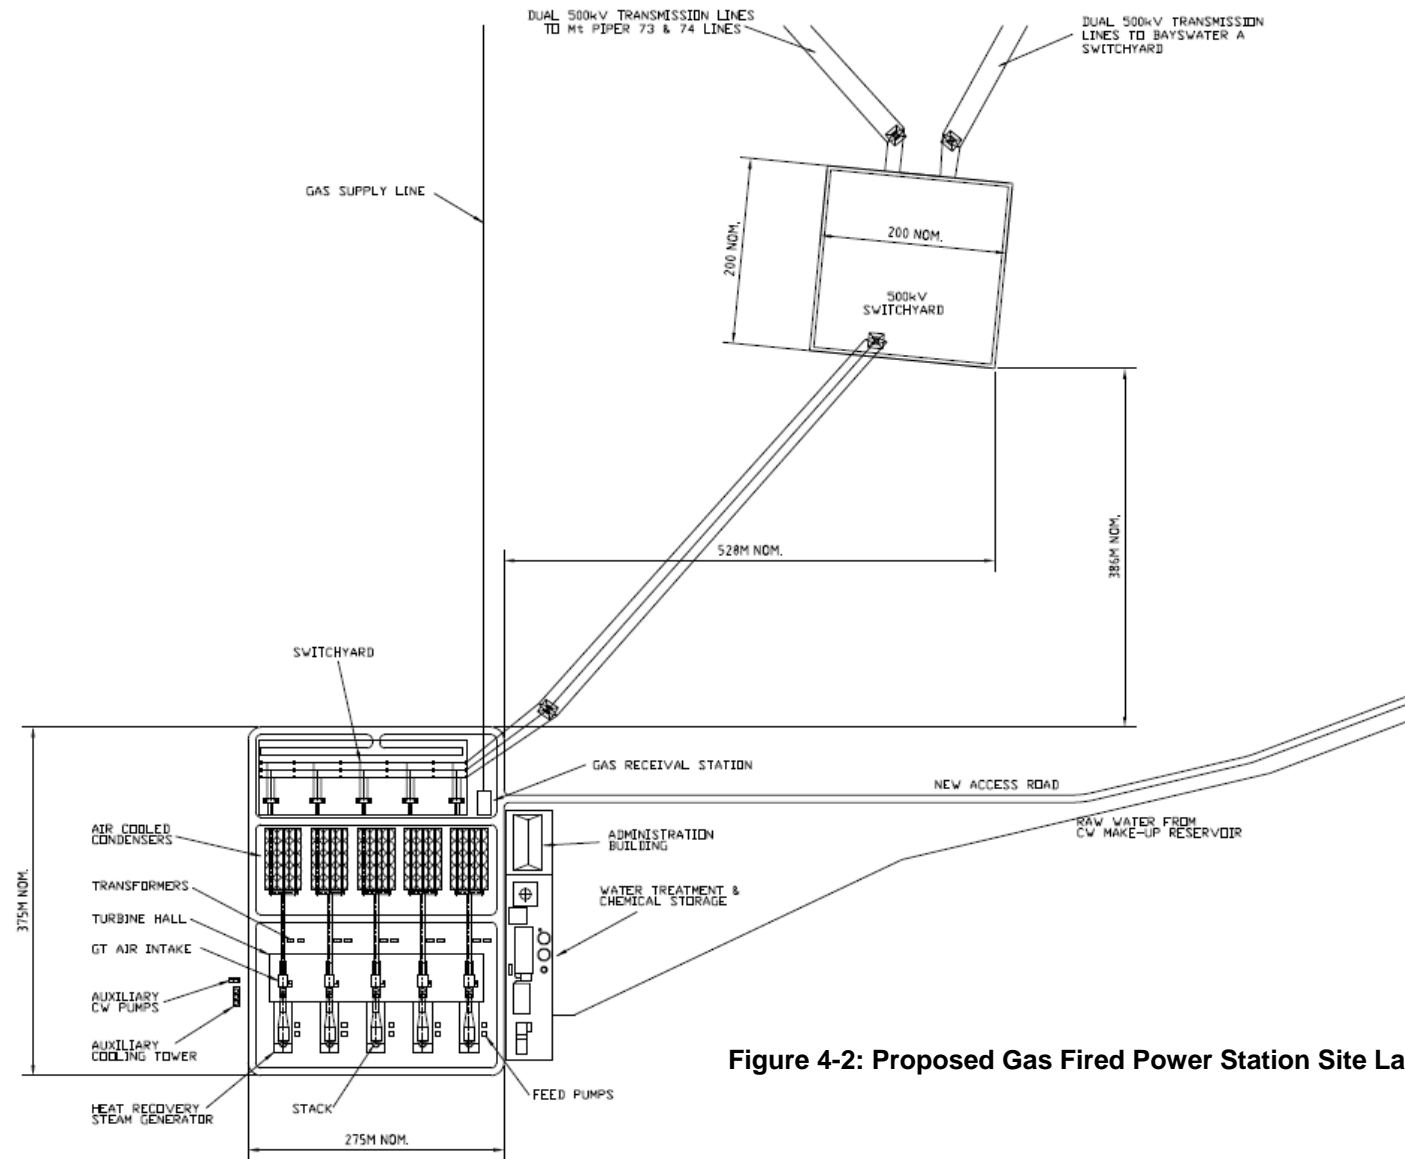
Proposed Gas Fired Power Station Site Layout
